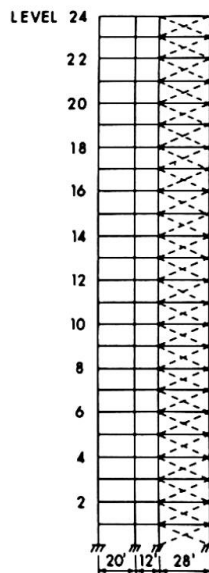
TWENTY-FOUR STORY STRUCTURE
